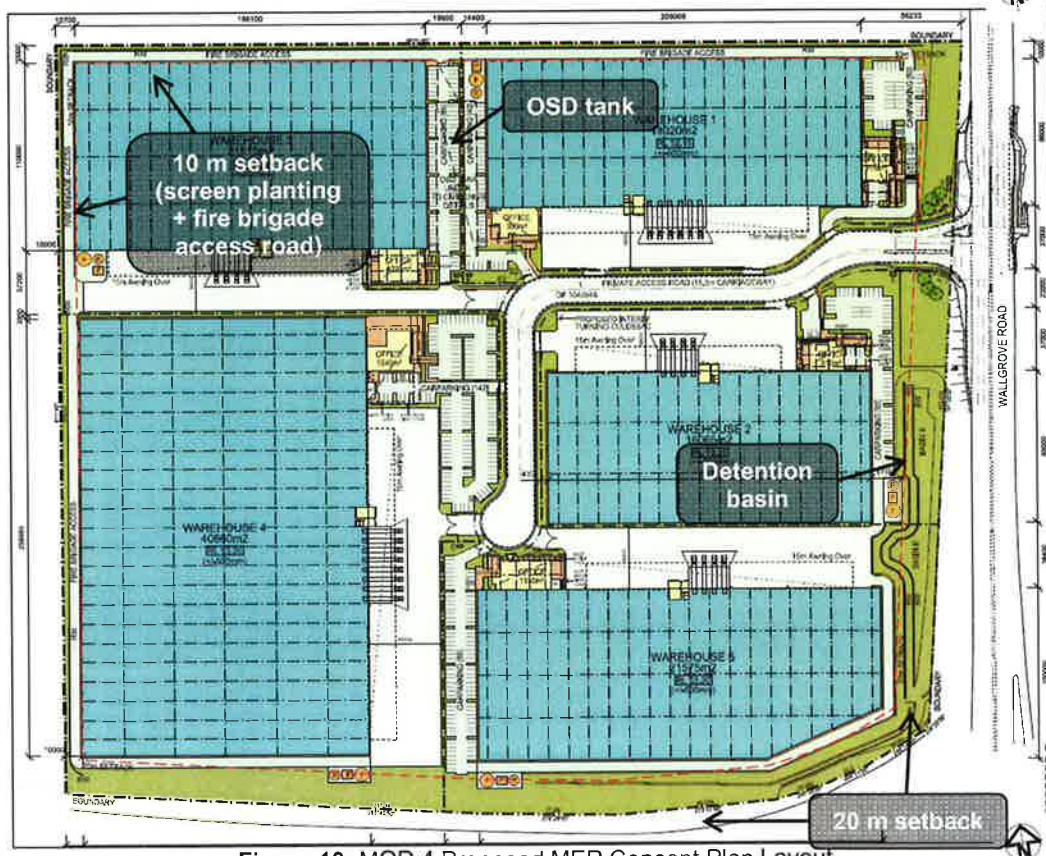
MOD 4 Proposed MEP Concept Plan Layout
